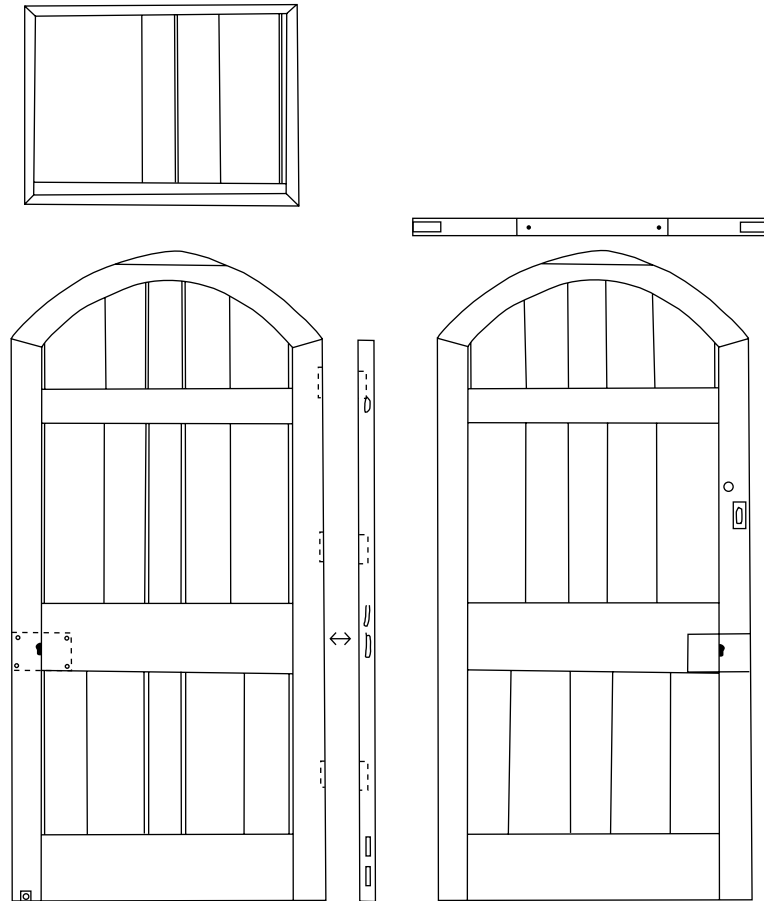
Door from doorways from inner courtyard into rooms 11, 12, 13 and 14 and a later fitted hatchway, (Feature F)
